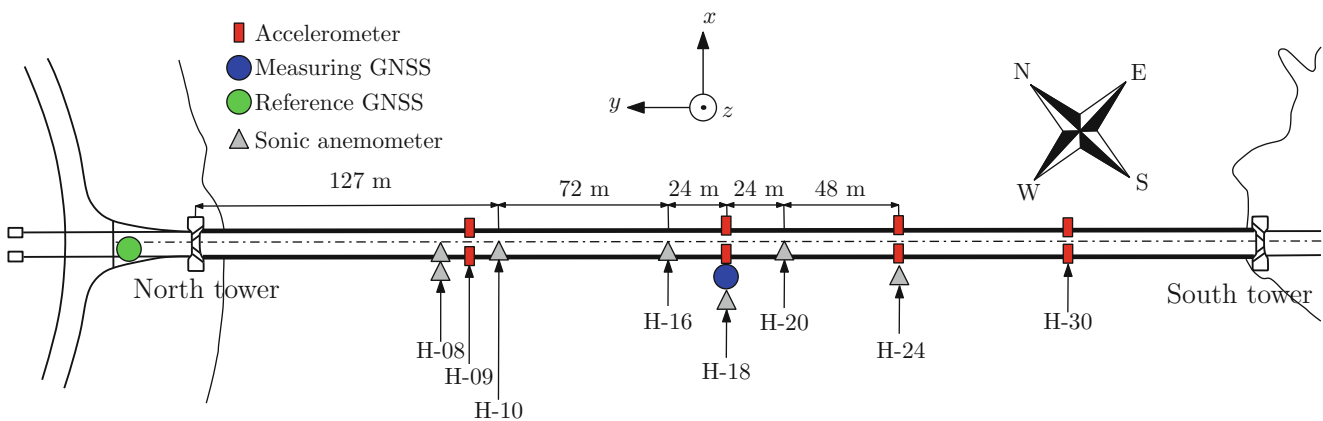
Wind and structural health monitoring system installed on the Lysefjord Bridge
